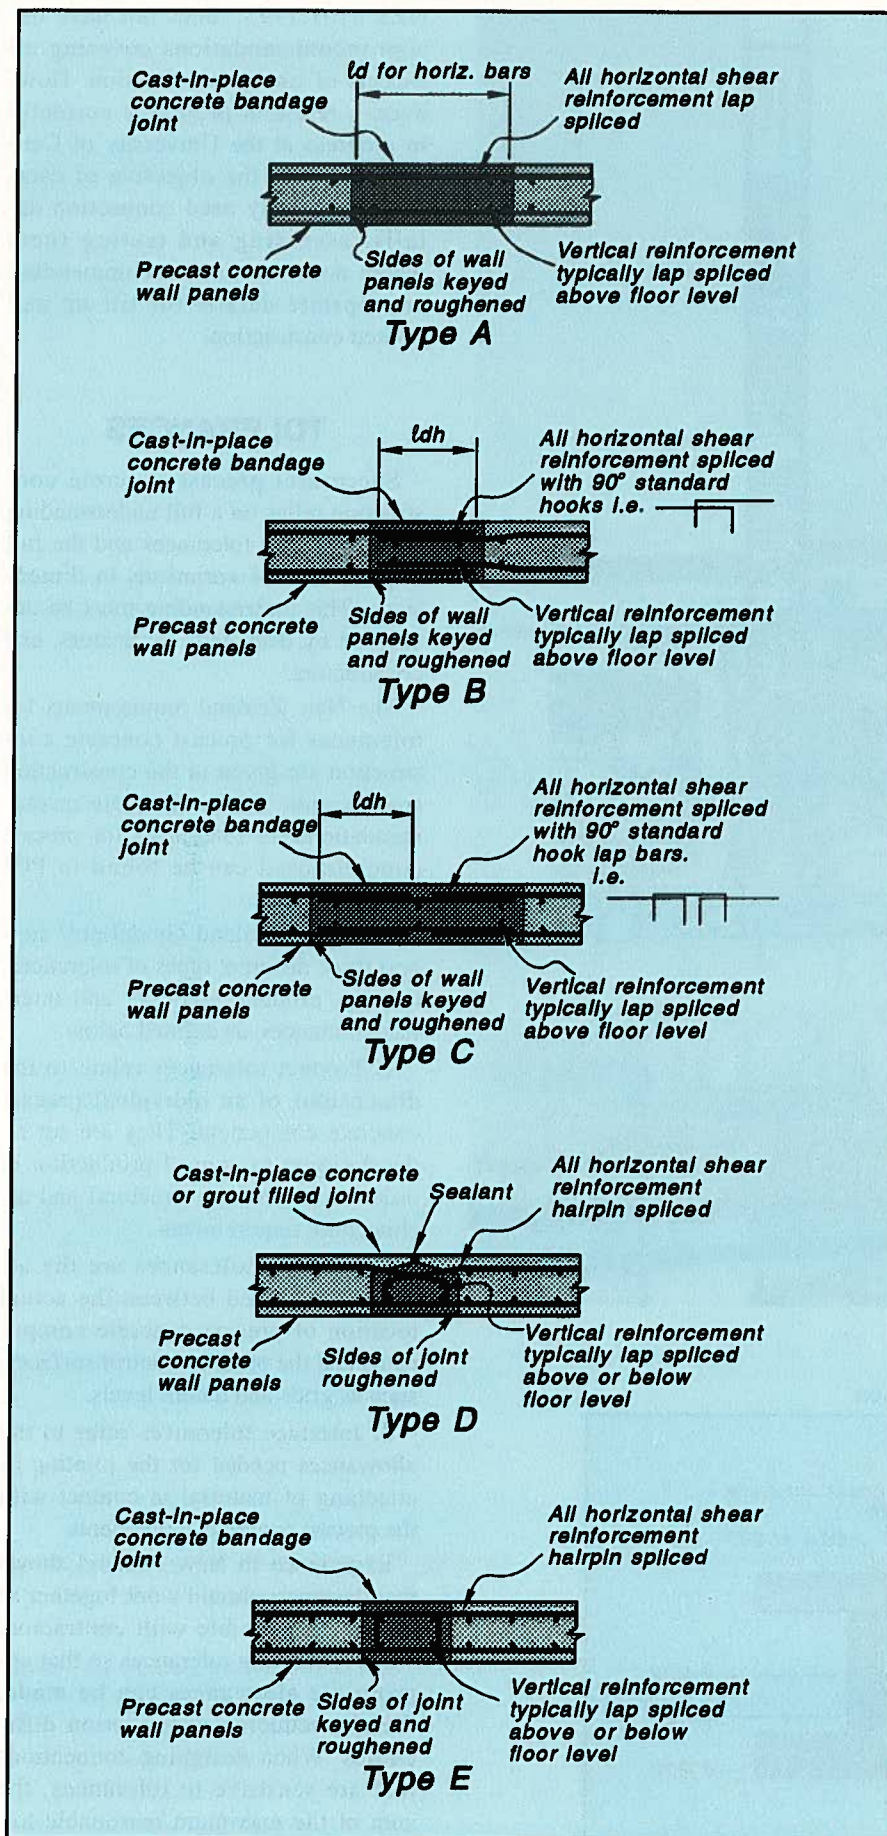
Some details of vertical joints in monolithic precast reinforced concrete wall construction (Ref. 3).
